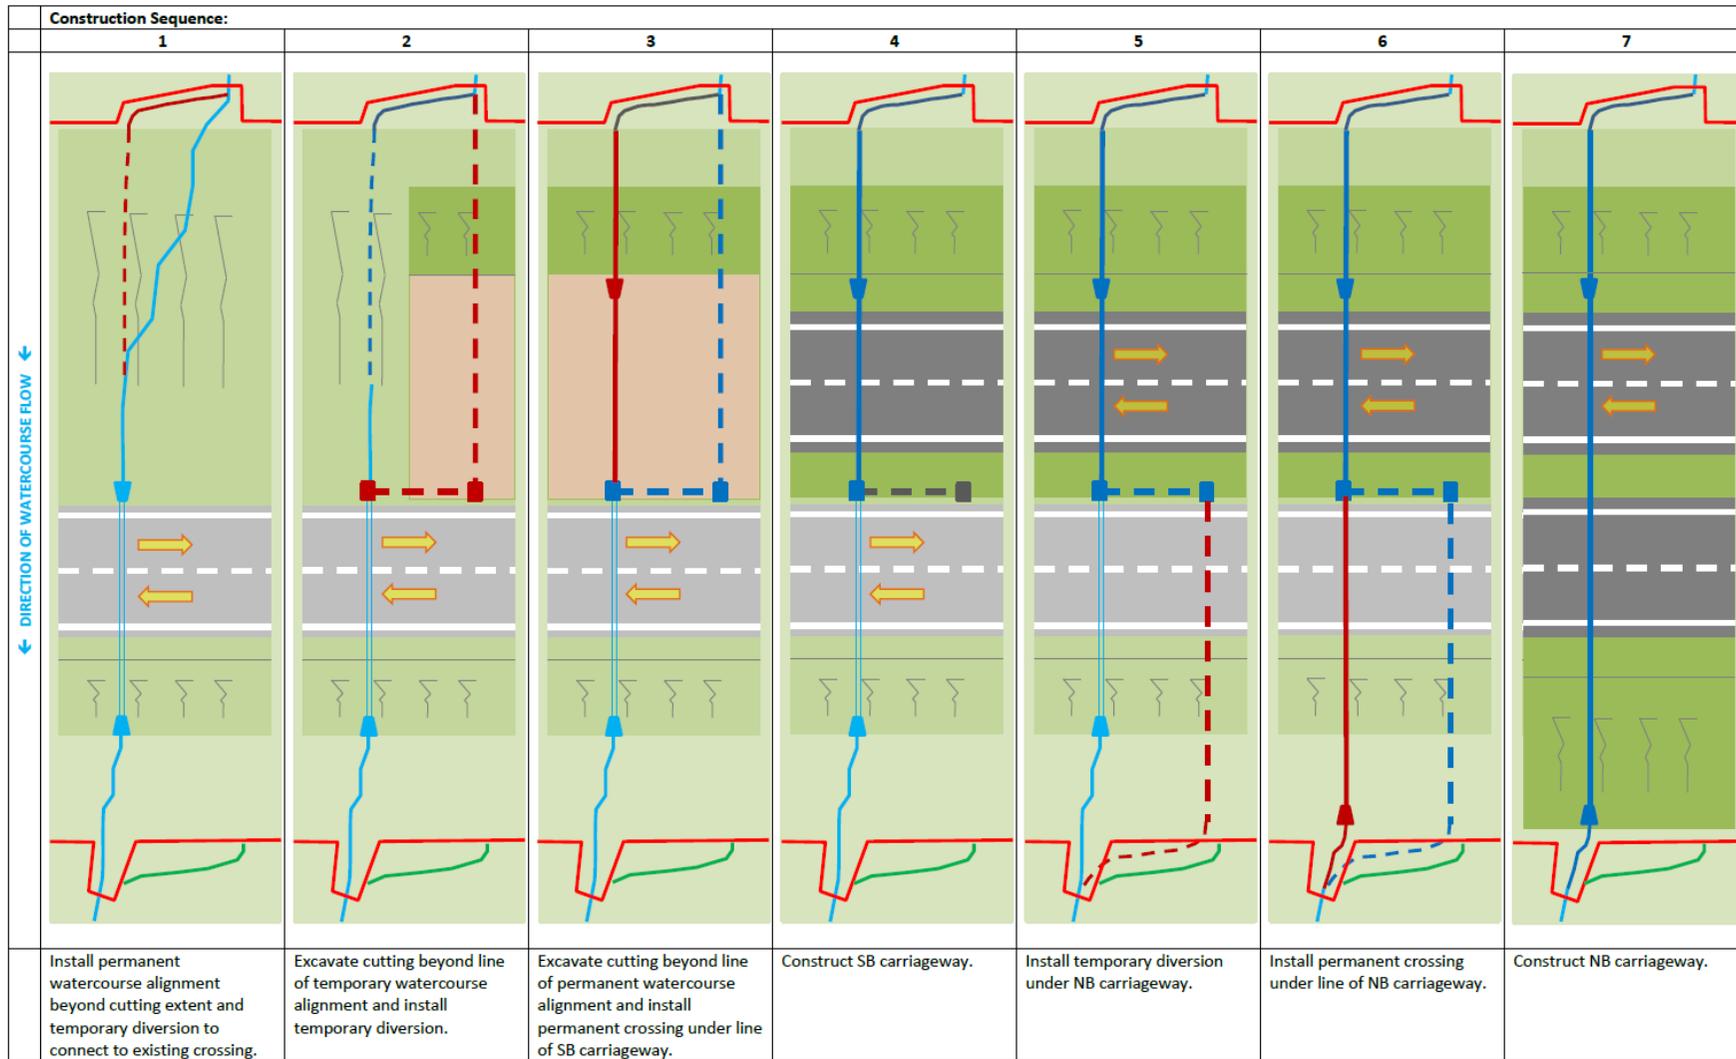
Widening to the east – road in cutting – on-line watercourse alignment
